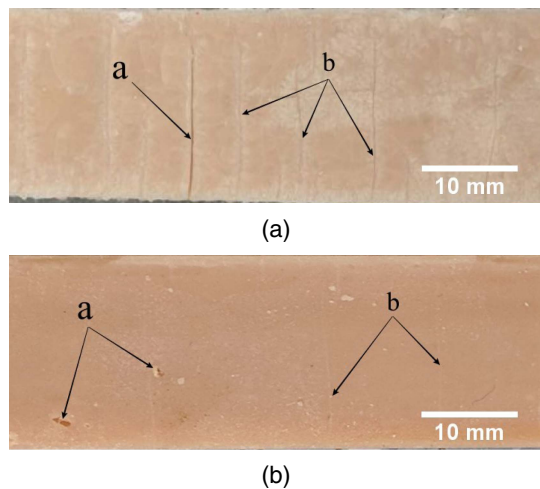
Surface defects of (a) C-MgO-M9H10; and (b) C-MgO-M3H10.
